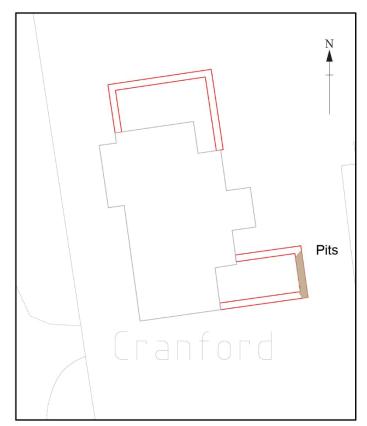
Trench plan showing pit locations (brown) and footing trenches (red)
